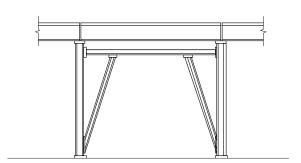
Modified Portal Crane Runway Bracing
